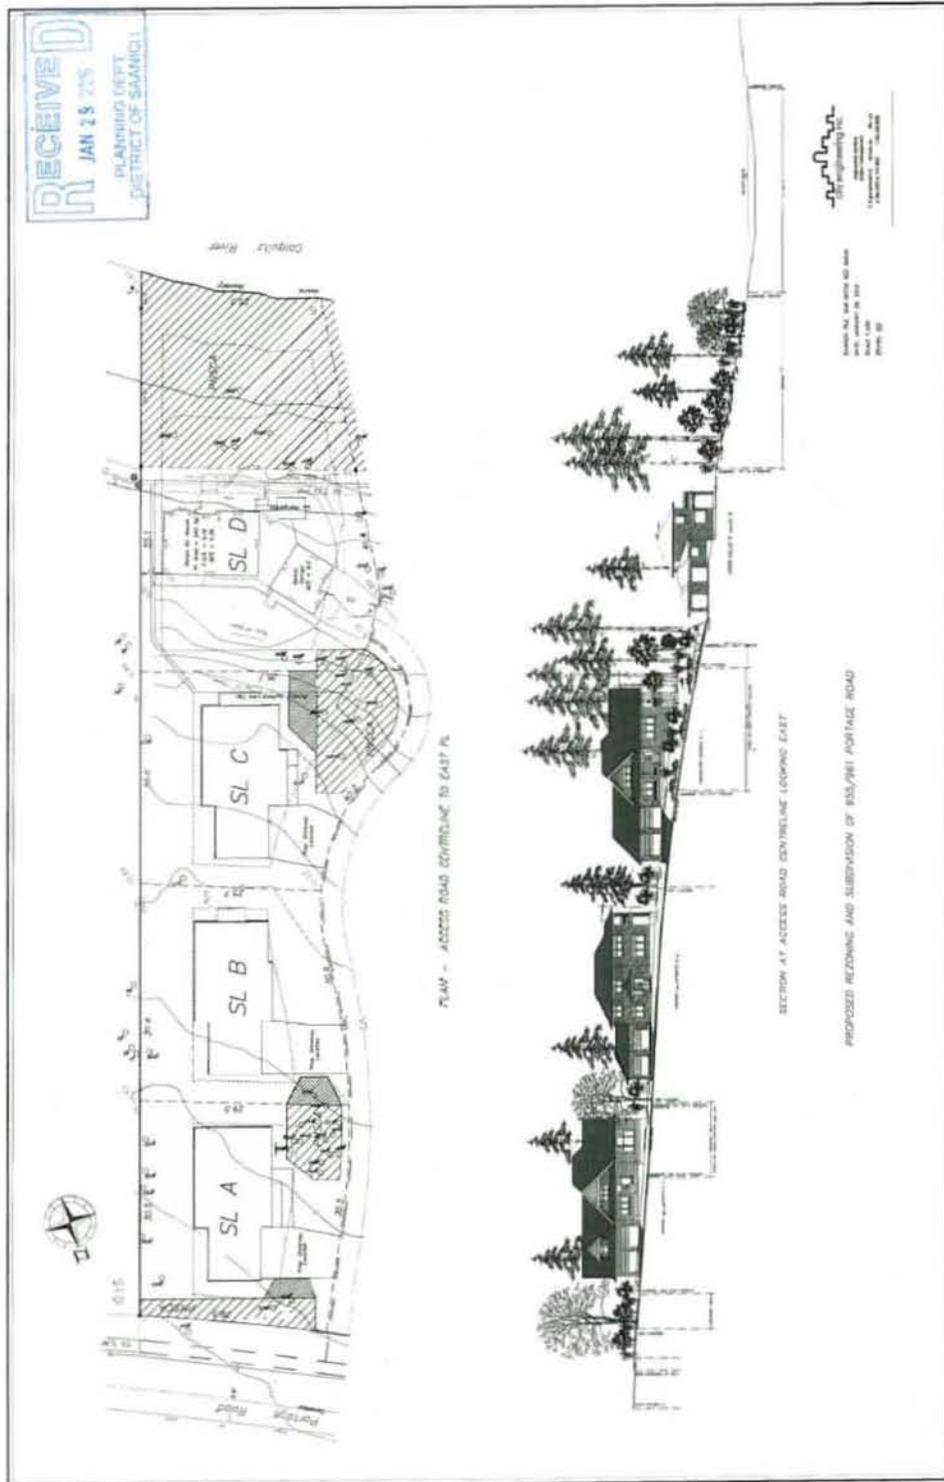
North-South Cross Section Looking West Along the Common Property Access Road
